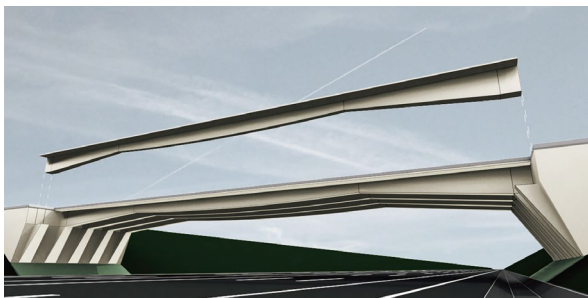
Integral Bridge and prefabrication are no contradiction. This bridge proposal shows concrete beam elements, post-tensioned with CFRP strands which are cast onto abutments to form an integral frame [2].
